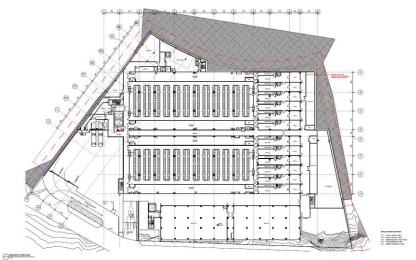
Ground floor Plan extract (Source: Greenbox Architecture)
